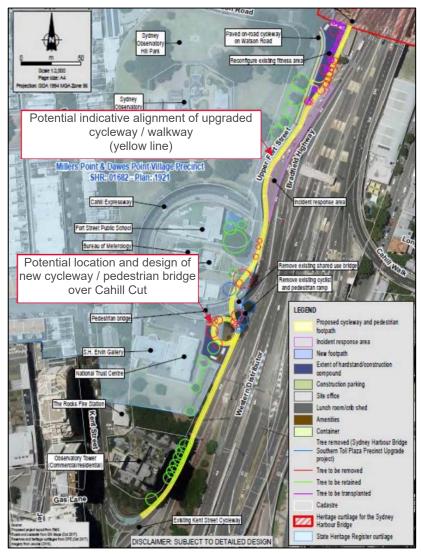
| Potential layout of potential cycleway / walkway upgrade (Source: Applicant's RtS 2020)
